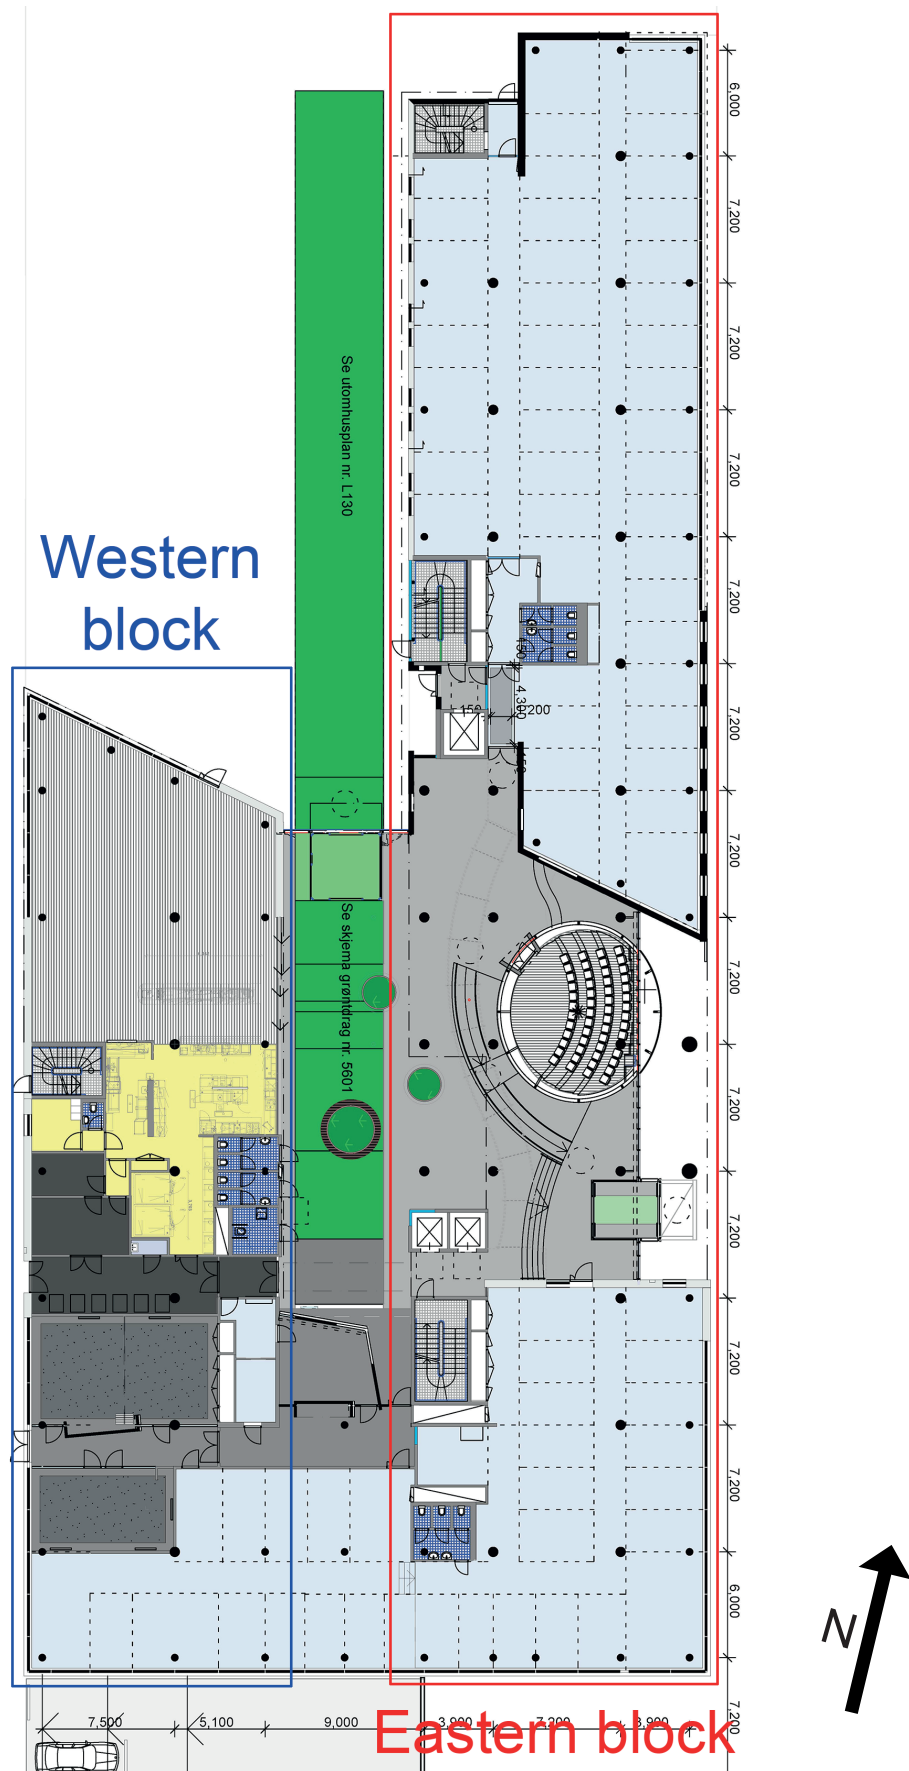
Edited floor plan of the first floor at Miljøbygget (Norske arkitekters landsforbund 2013).
